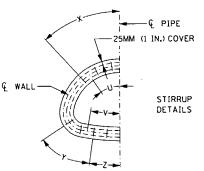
Details of structural design, Class IV pipe, 1972.
